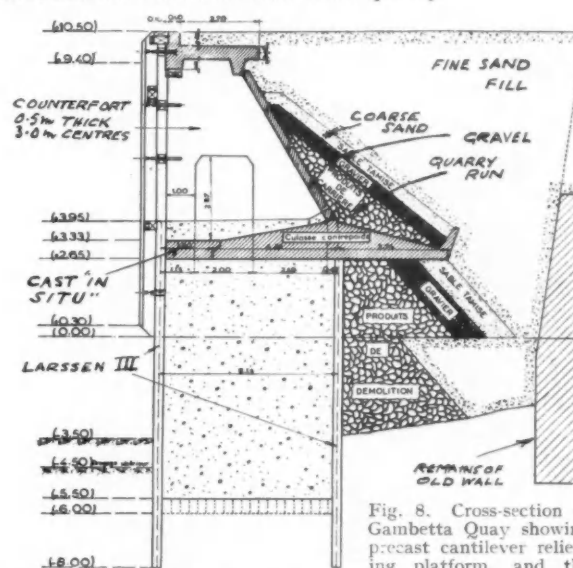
Cross-section of Gambetta Quay showing precast cantilever relieving platform, and the novel arrangement of revetment of backfill. Sections cross hatched are precast. Note backfill grading.
